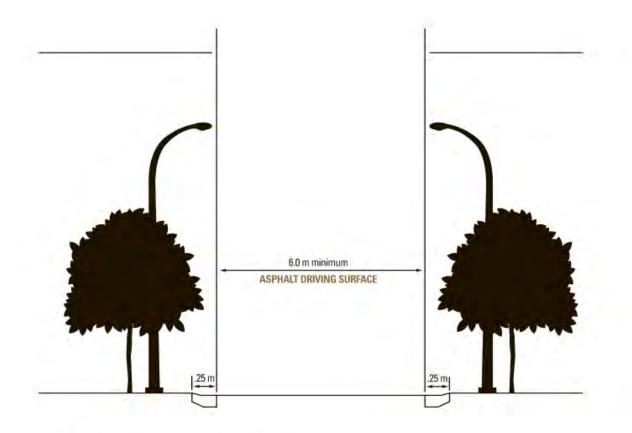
FIG. G: EMERGENCY ACCESS ROUTE, ONE-WAY OR TWO-WAY STREET NO PARKING PERMITTED, NO-PARKING SIGNS POSTED EACH SIDE 20 m APART, 2.3 m ABOVE SURROUNDING GRADE
